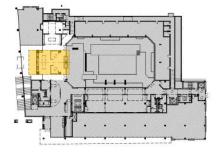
| Level 1 Lighting Layout - Kitchen + E-Lounge
